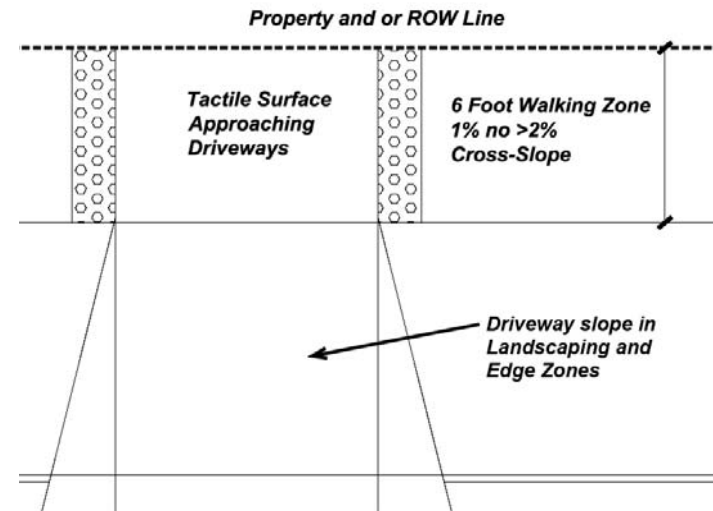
Driveways Slope and Tactile Approaches on the Walking Zone
